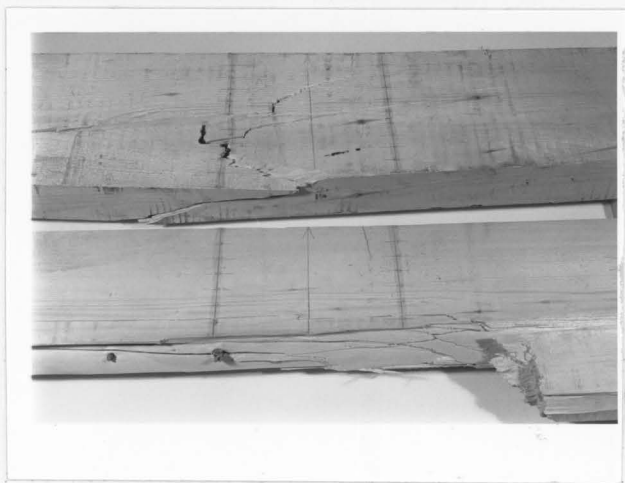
TYPICAL FAILURE IN 4 x 12 CLEAR BEAMS SUBJECTED TO CENTRAL LOADING
